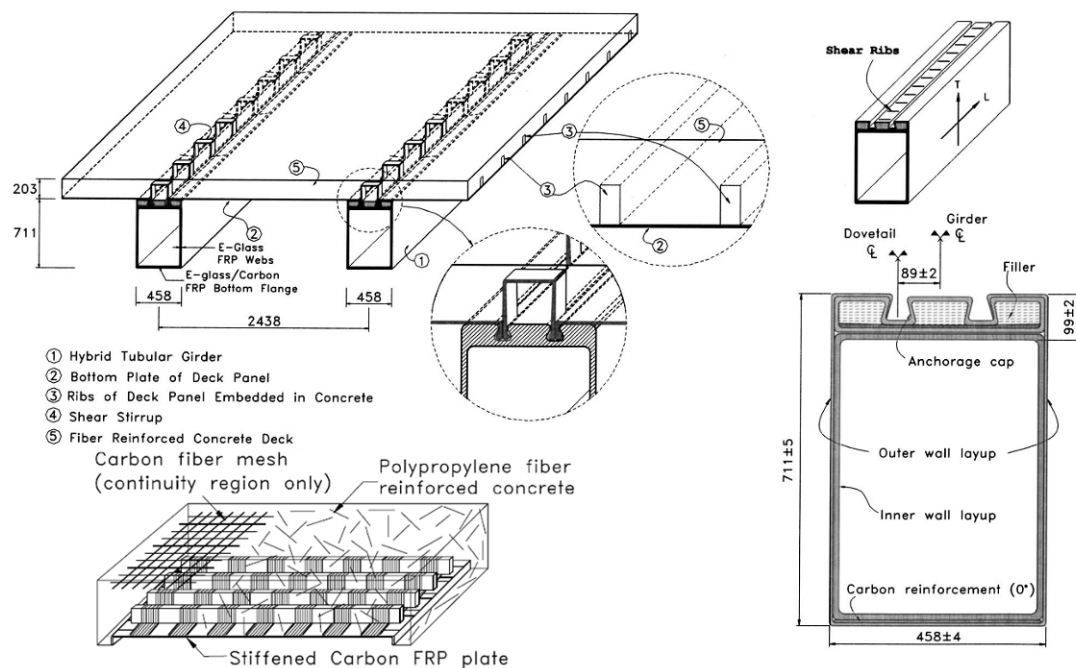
Steel-free hybrid FRP-concrete bridge with FRP tubular girders [119]
